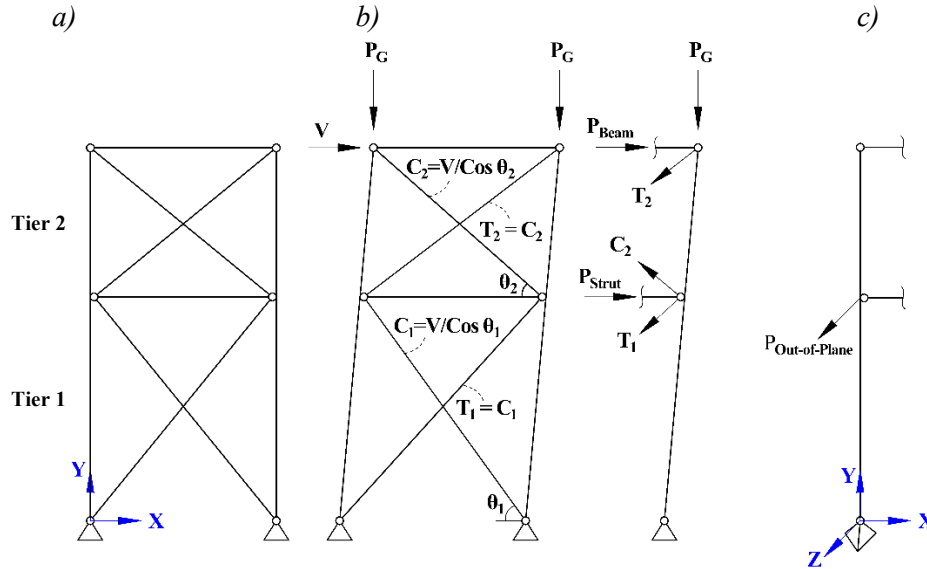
Column design forces for a Type CC two-tiered CBF: a) two-tiered CBF; b) column in-plane demands; c) column out-of-plane demands.
